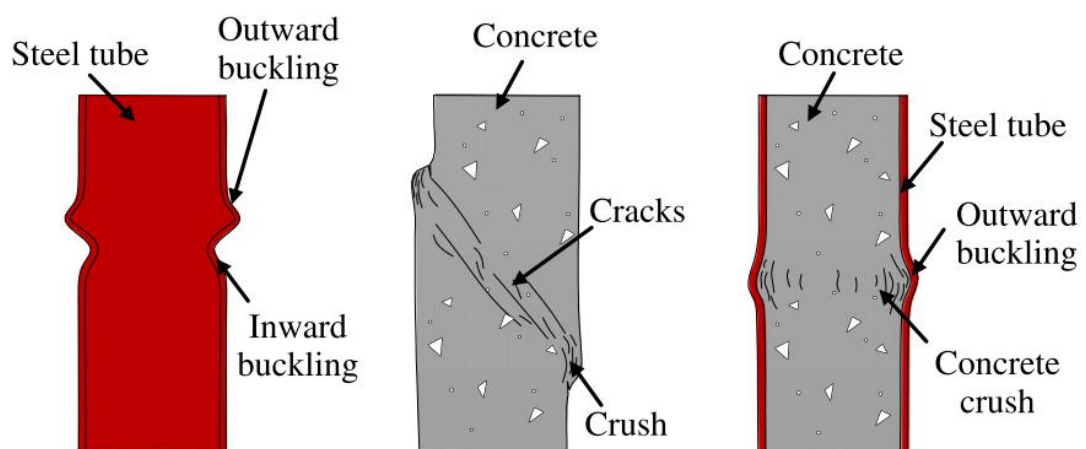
Typical mode of failure for steel tube, plain concrete and CFST column
